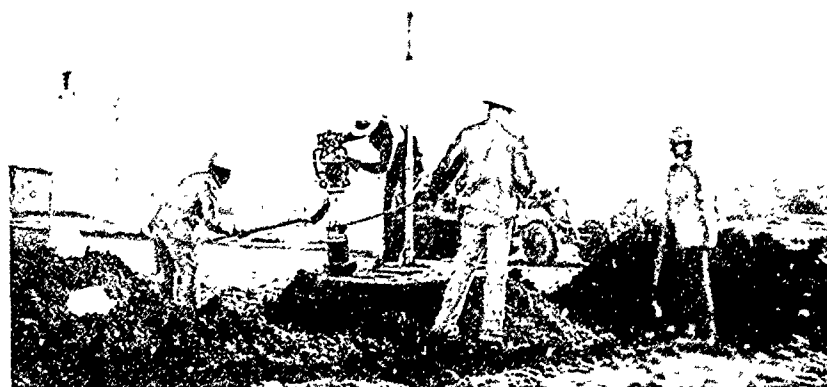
Fill placement of mound around piezometer, Jan 63
